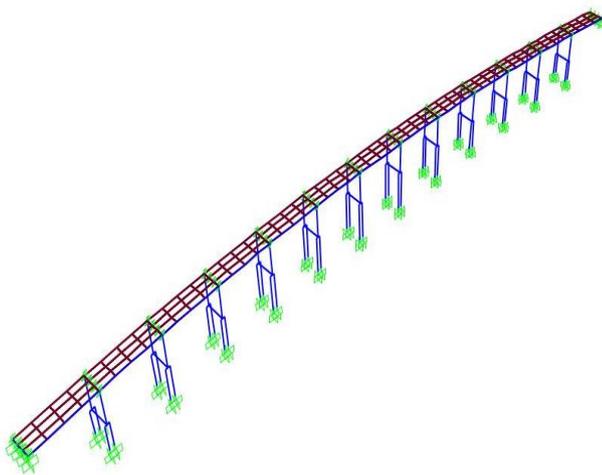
3D view of C type curved bridge with elastomeric pad bearing
